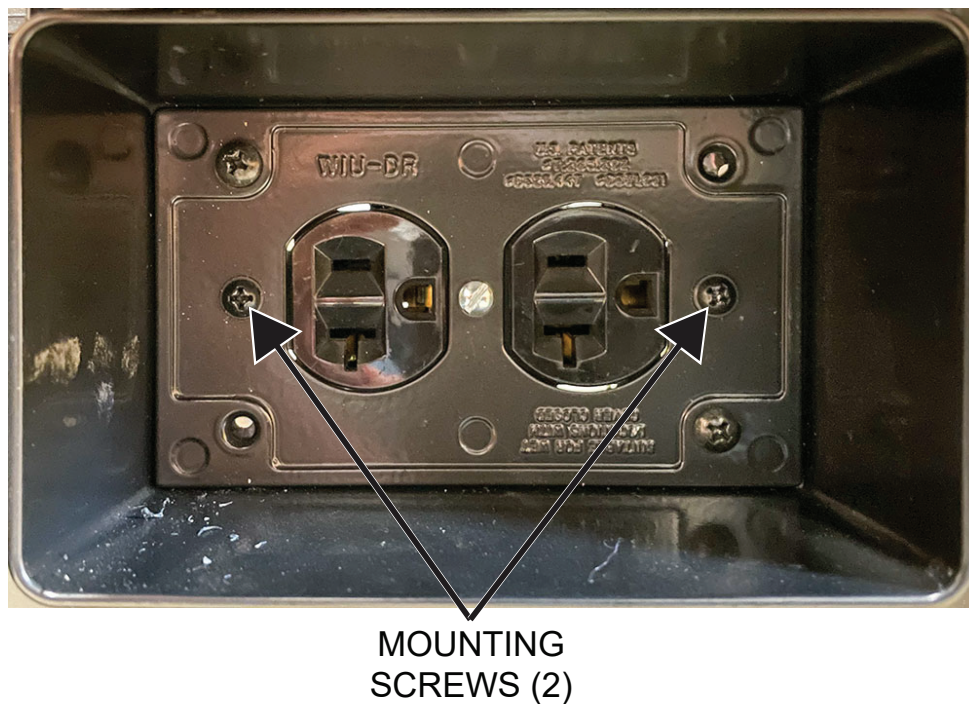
Receptacle, mounting bracket and rubber cover locations
